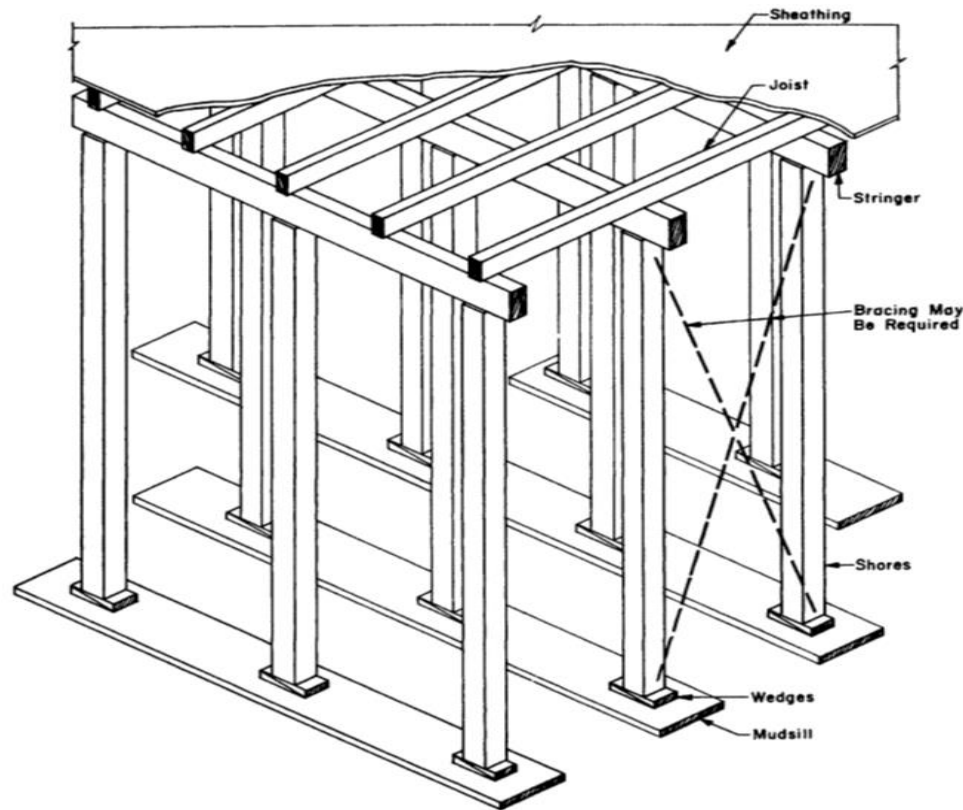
Beam and slab form. (Courtesy of American Concrete Institute)
